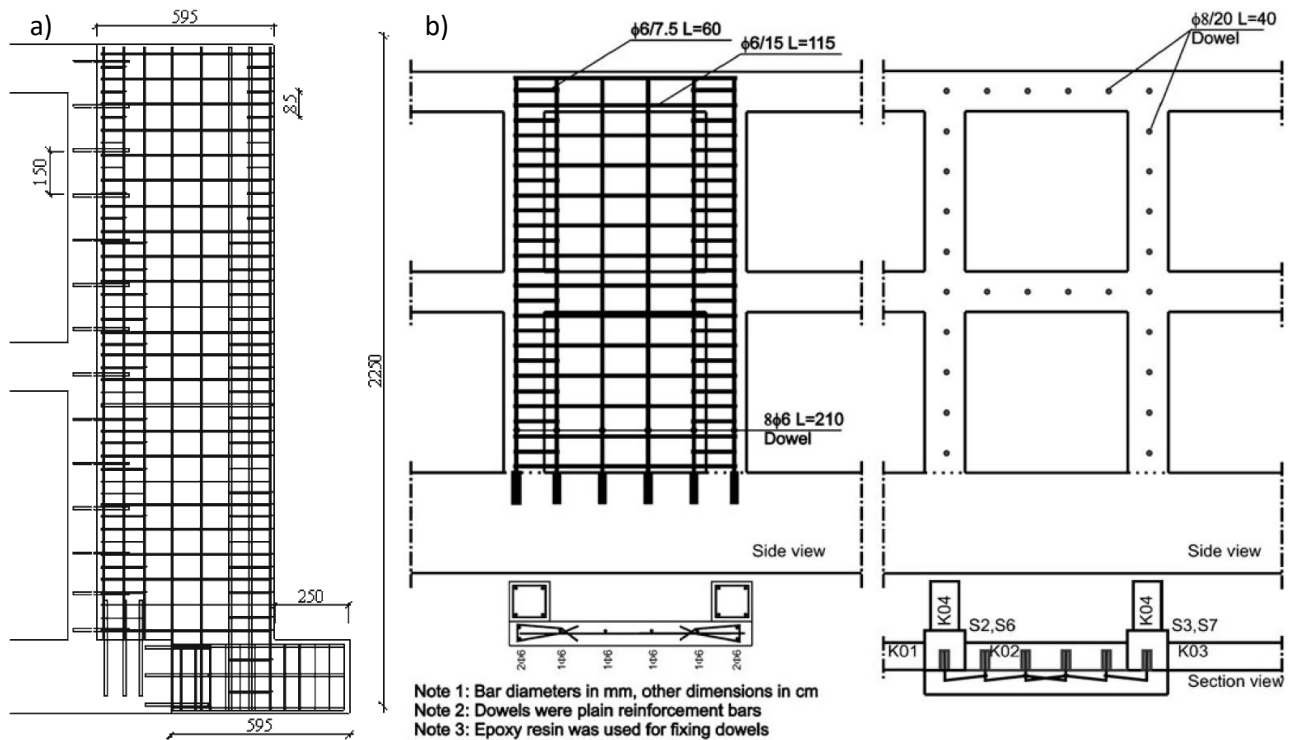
Reinforcement bars and anchorages provided in the new shear walls and between the two structures; a) shear wall perpendicular to the façade; b) shear wall parallel to the façade – Source: [47, 106]
